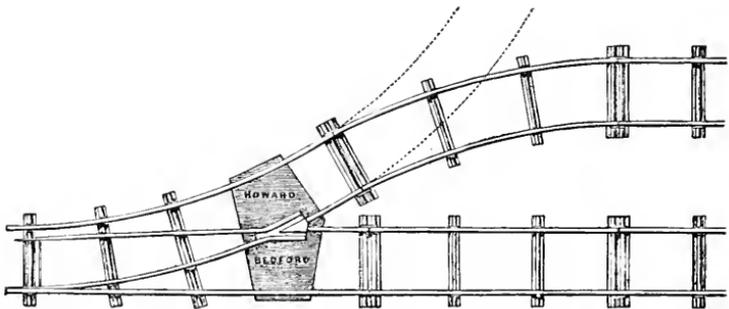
ARRANGEMENT FOR SIDING FOR PORTABLE RAILWAY.
